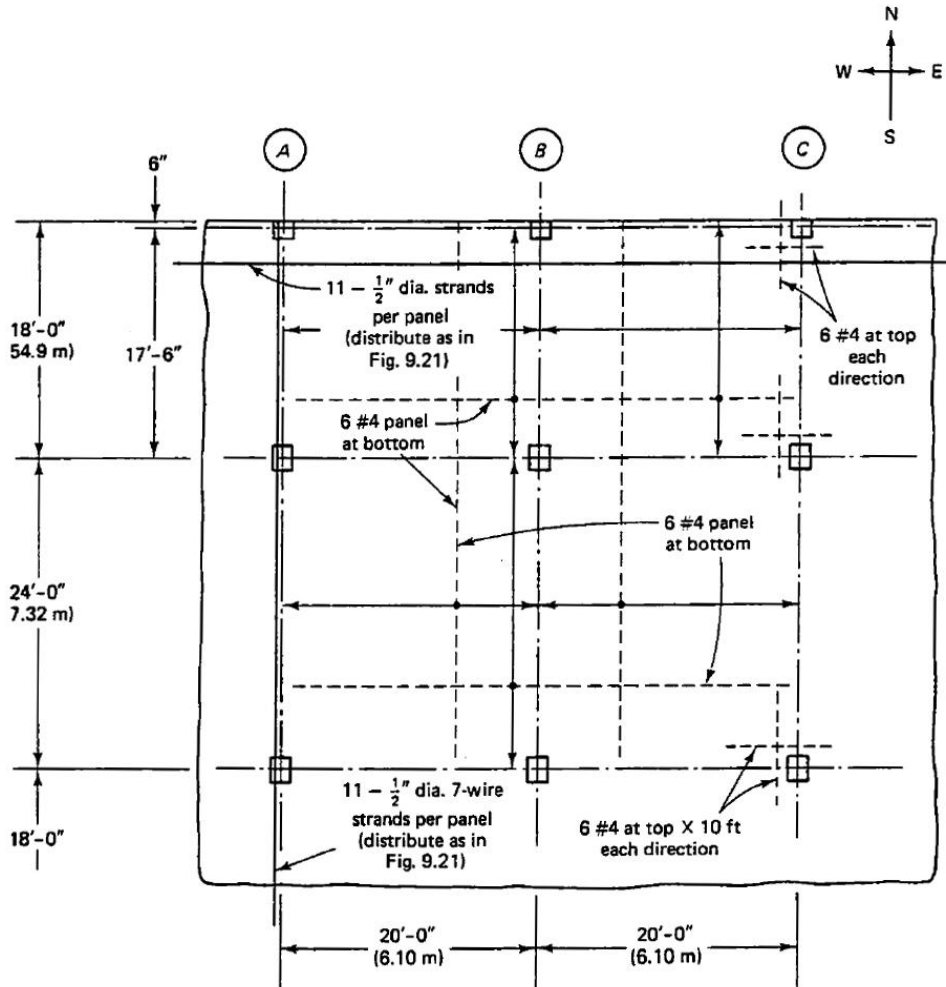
Schematic reinforcement distribution, partial floor plan for Example 9.2.
